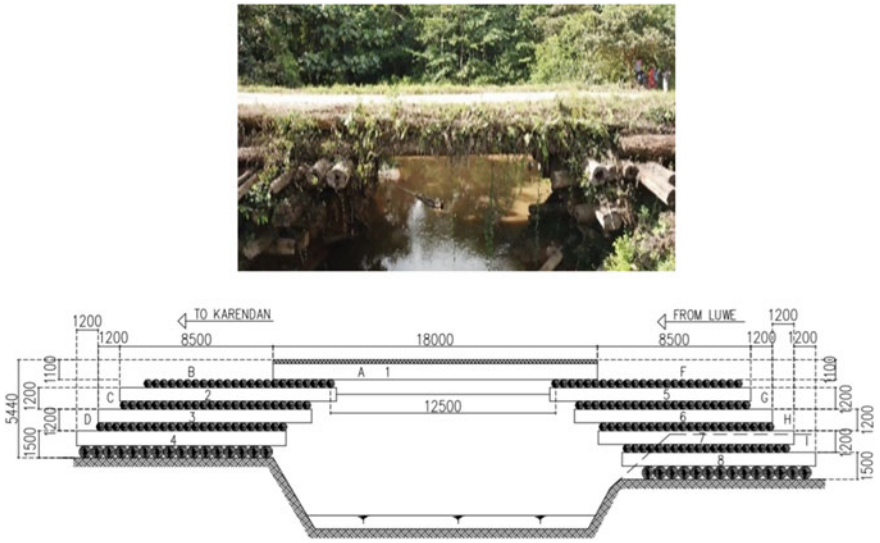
Documentation and structural sketch of Palili bridge after 1st modification (2018)
